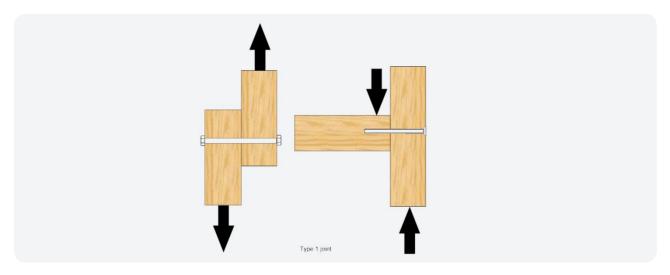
Joint Type 1 – shear load (Image credit: TDA)
